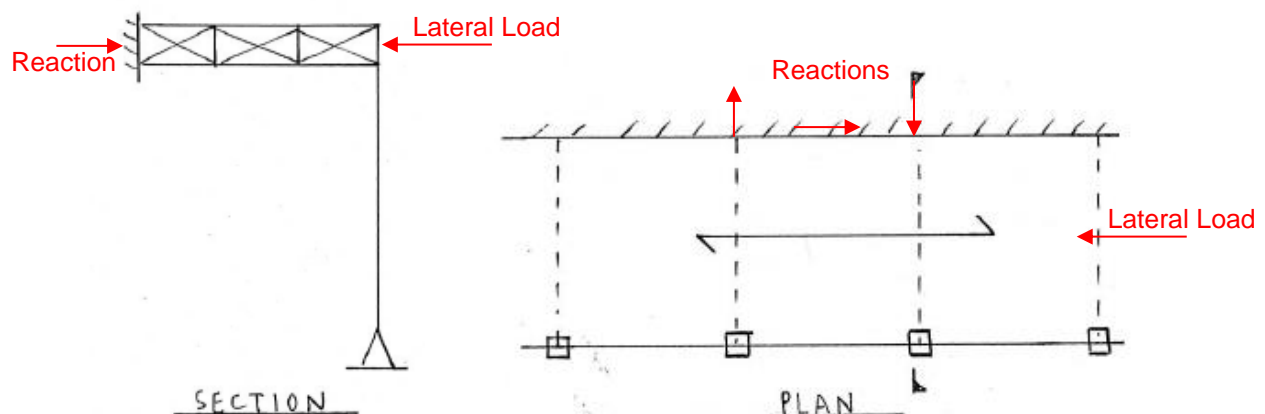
shows a typical section where the lattice beam spans from the cast iron column to the mass concrete wall.
